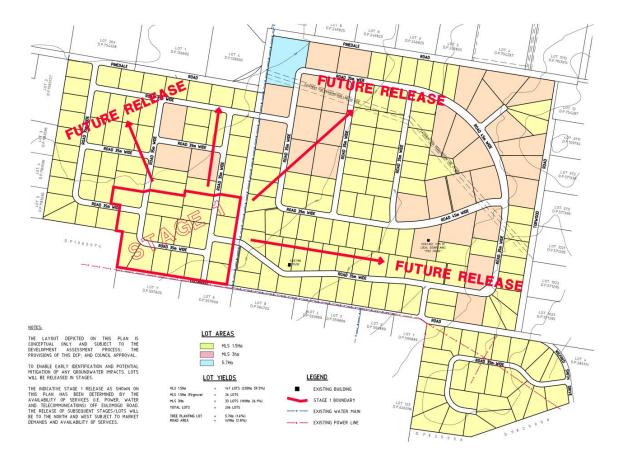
Daisy Hill DCP Conceptual Layout and Staging Plan
